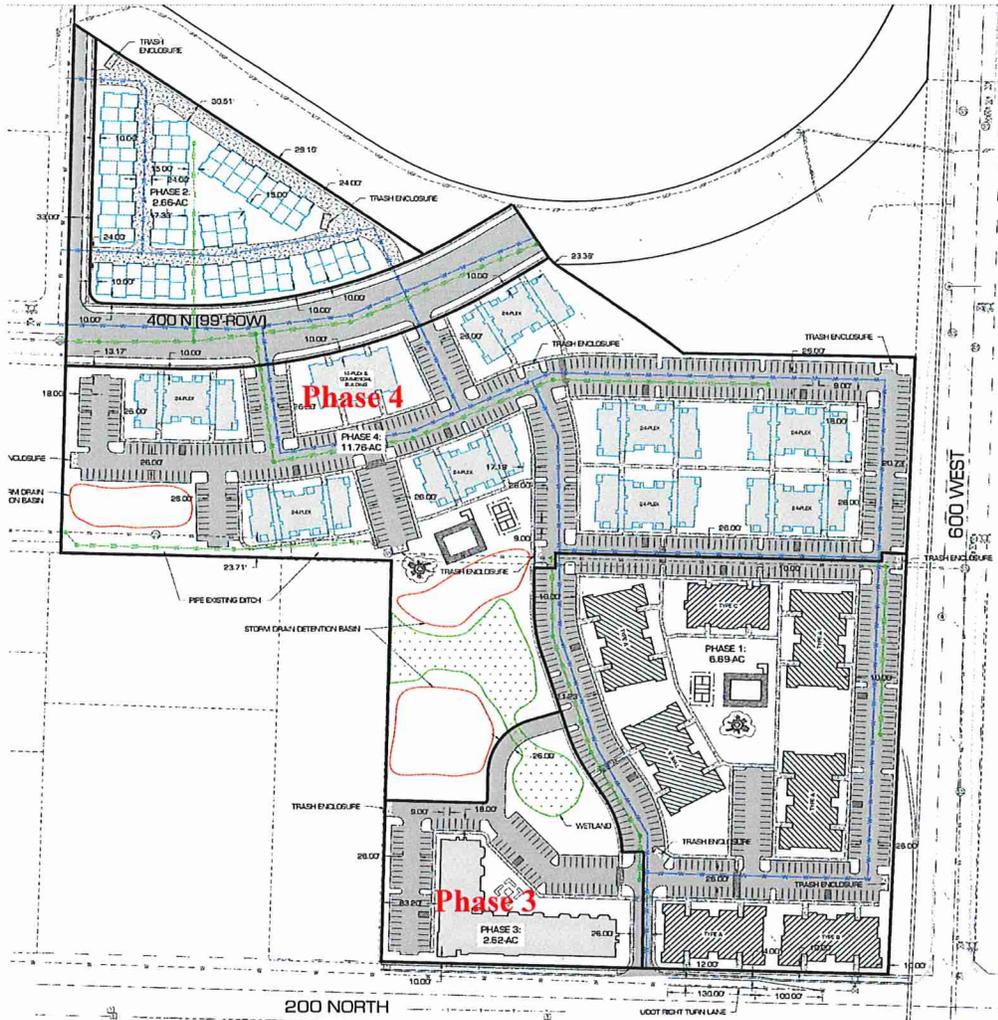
shows the original April 2020 phase 3 & 4 site plan approval
